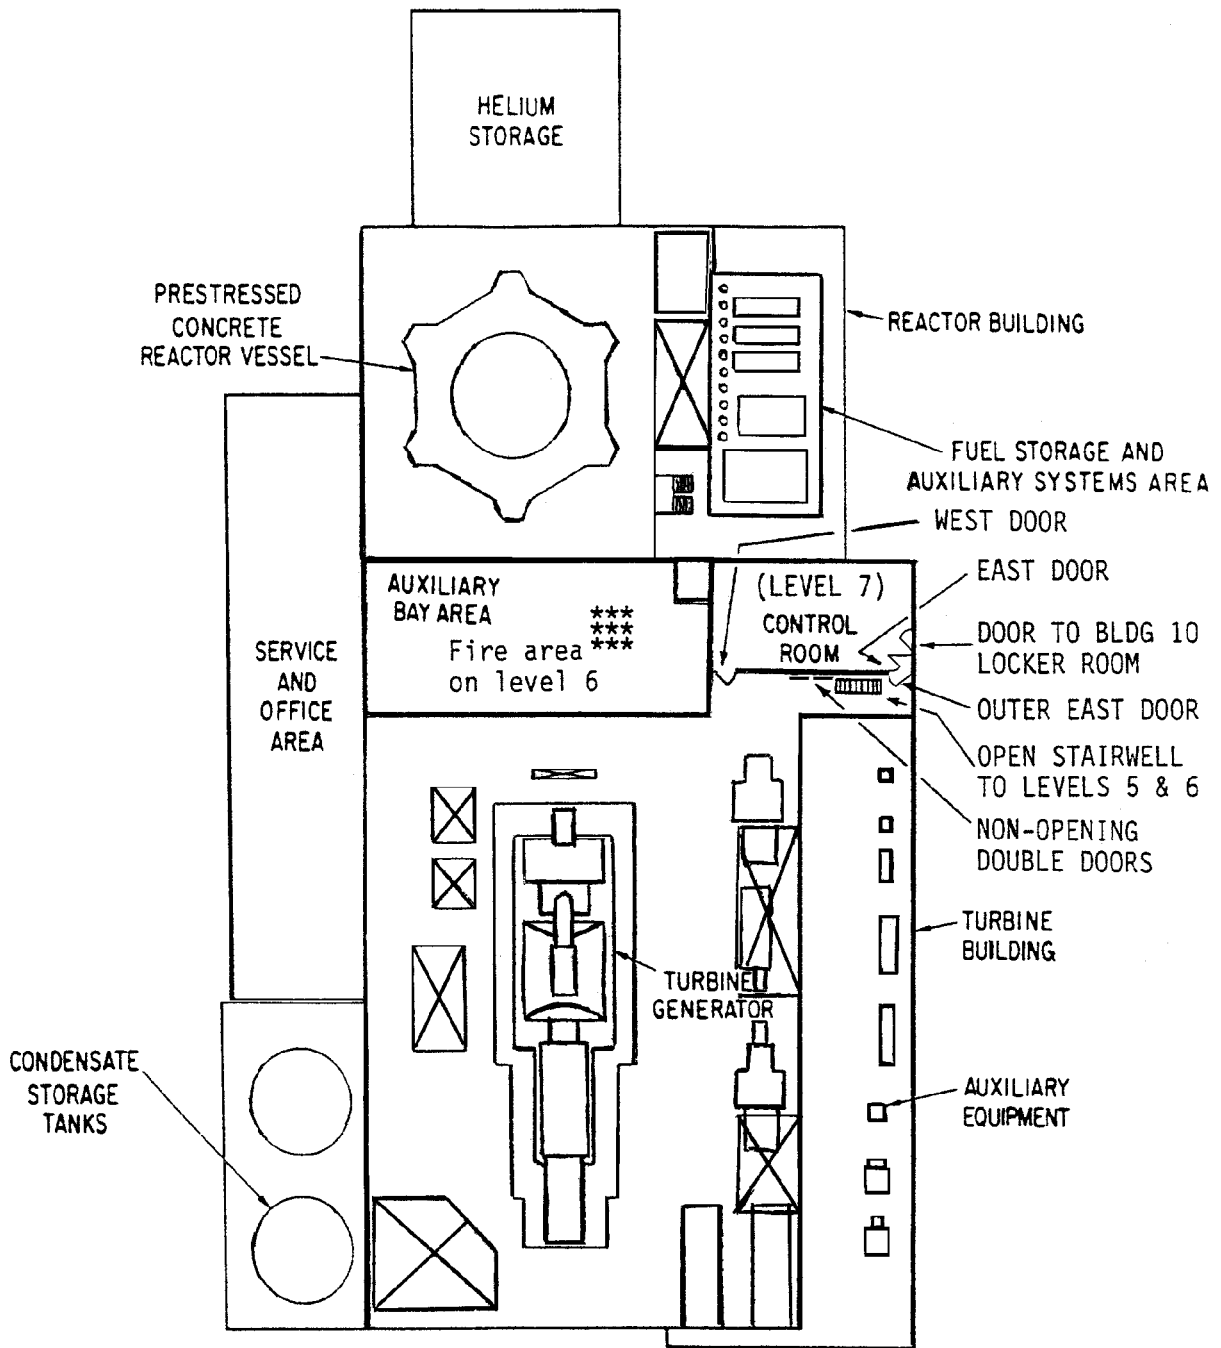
Plan view of the reactor building and turbine building including fire area on Level 6 and control room on level 7 (from Reference A14-1).
